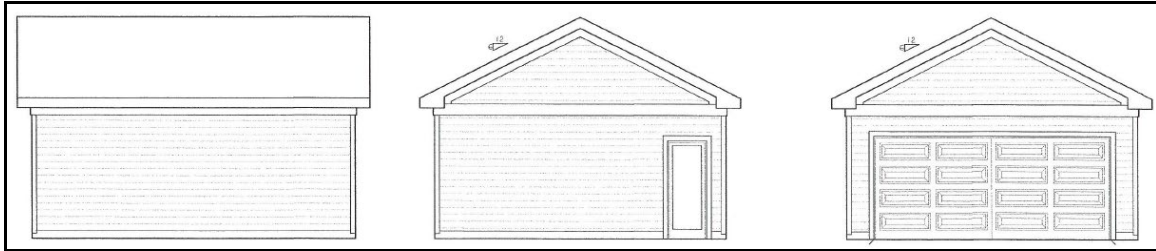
Elevations of proposed outbuildings. Two identical outbuildings are proposed
